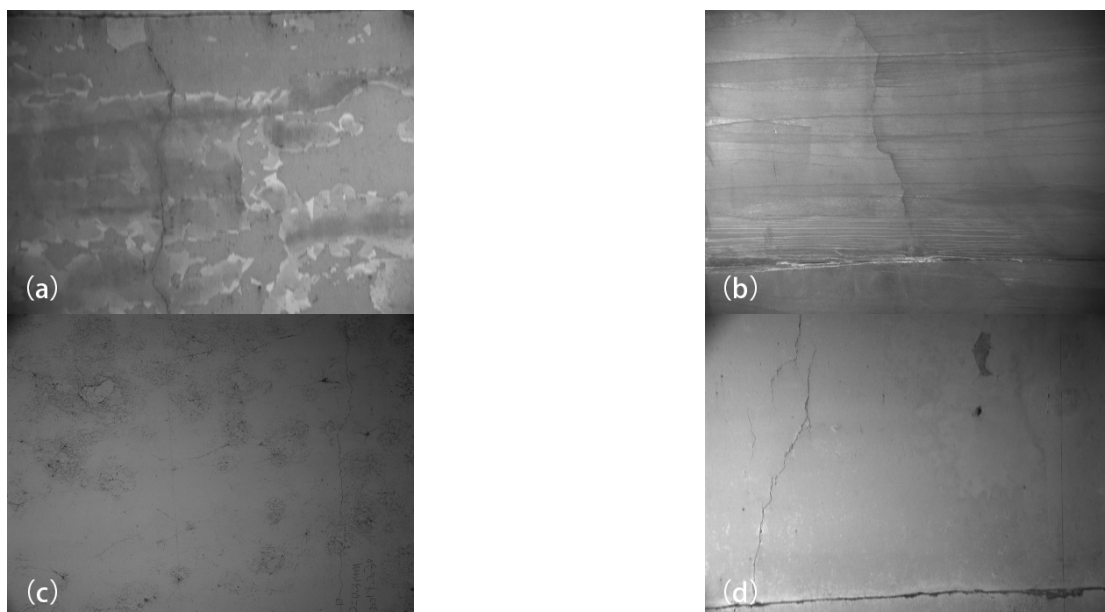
Images of tunnel lining cracks, (a) cracks picture with breakage, (b) cracks picture with seepage, (c) cracks picture with stains, (d) cracks picture with expansion joint.
